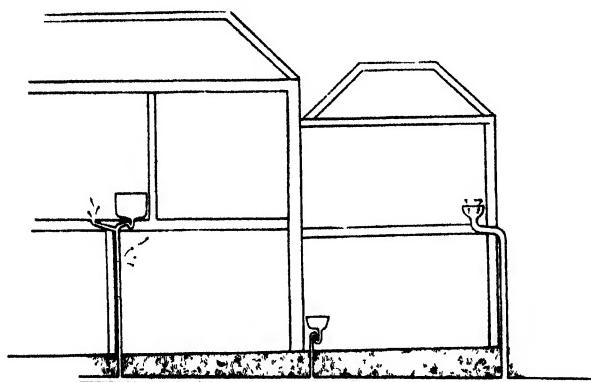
Bad planning leaky joints allowed sewer gas to escape into a children's playroom causing serious outbreak of sickness.
